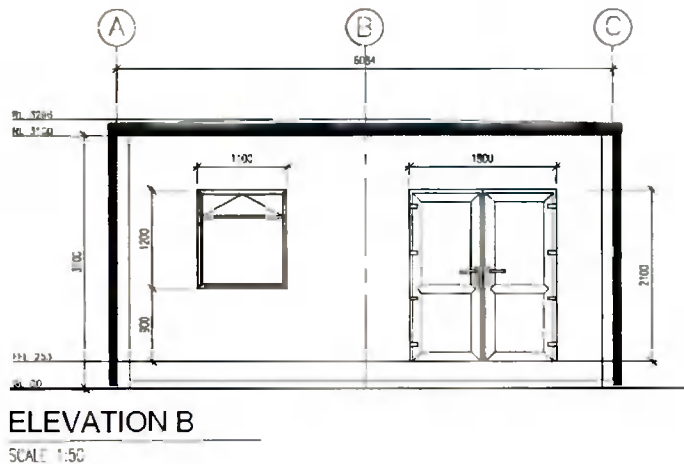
Elevation of the cabin to be retained (Scott Tallon Walker)
